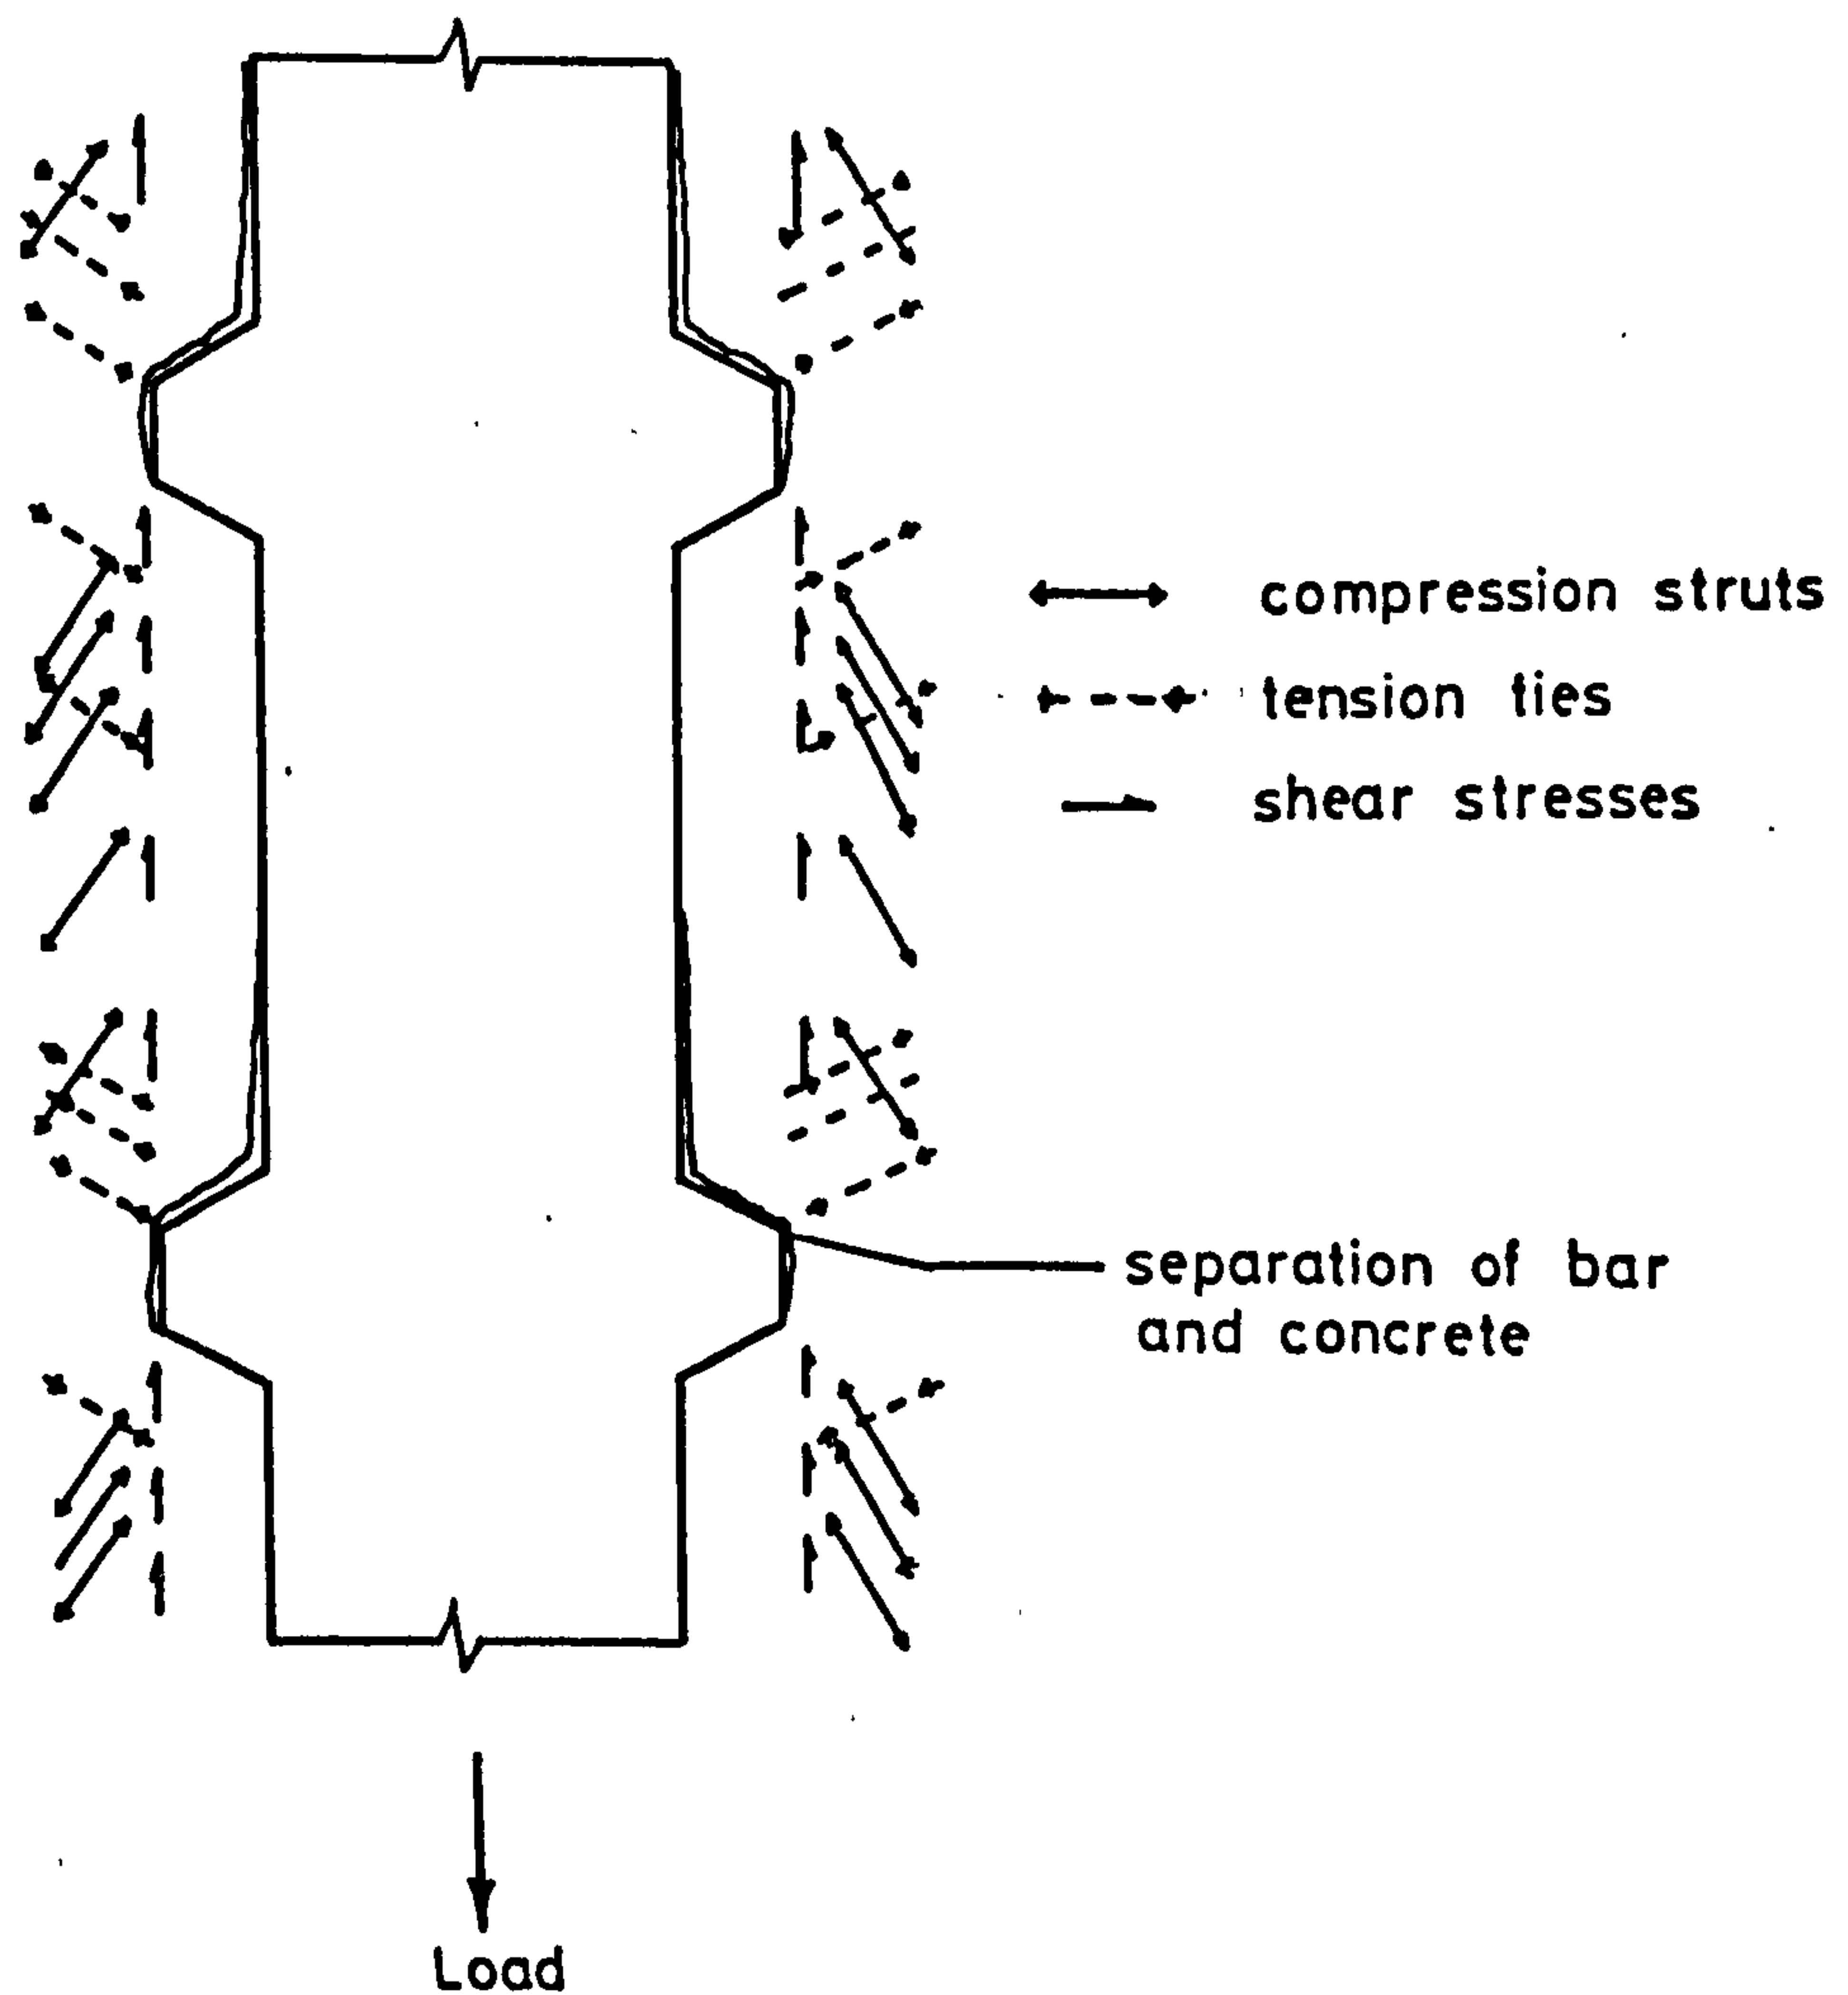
Compression struts and ties around ribbed deformed bar in bond - high bond stress.
